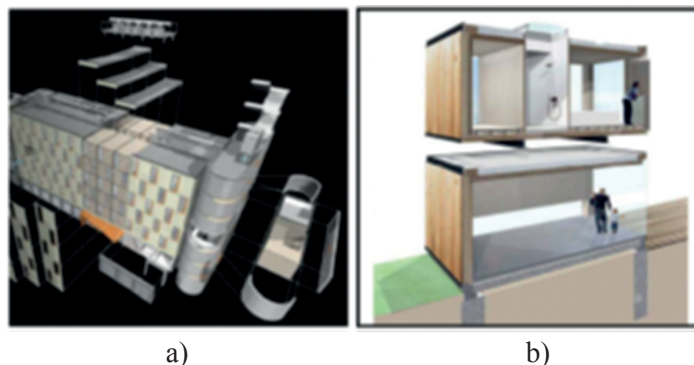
Schematic illustration of modular design and construction principles: a) complete multi-storey building: adopted from [9], b) Individual modules with timber cladding on wall panels [10]
